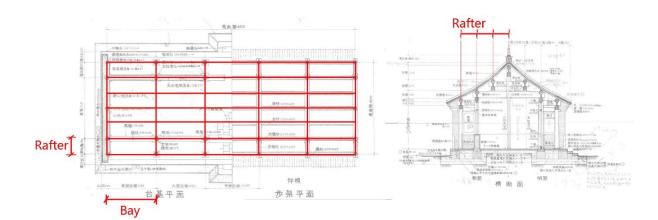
The floor plan (left) and the section (right) of a traditional Chinese building with 5
